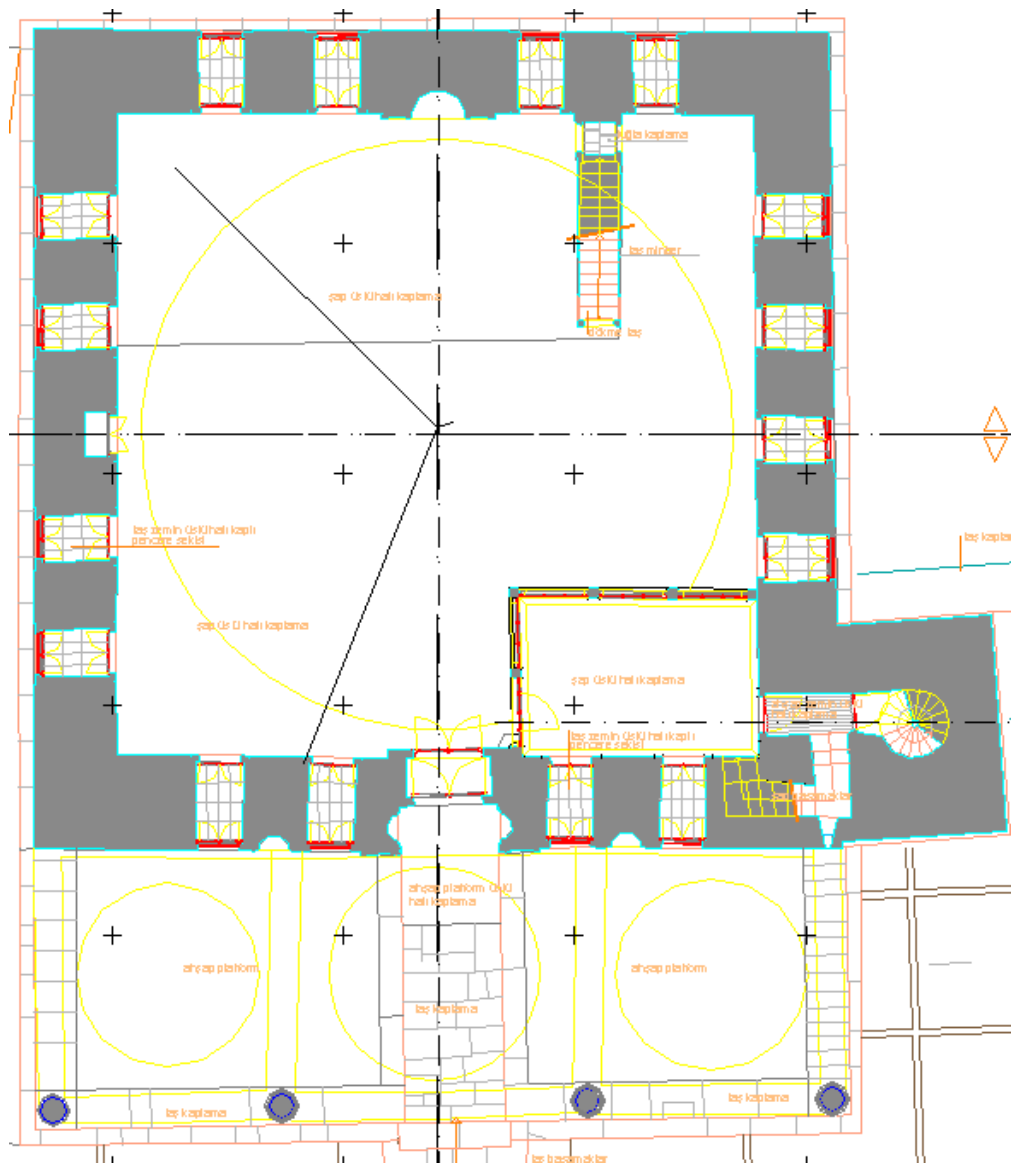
Structural Plan of the Mosque (drawings by SAYKA Construction Architecture Company, 2008)
